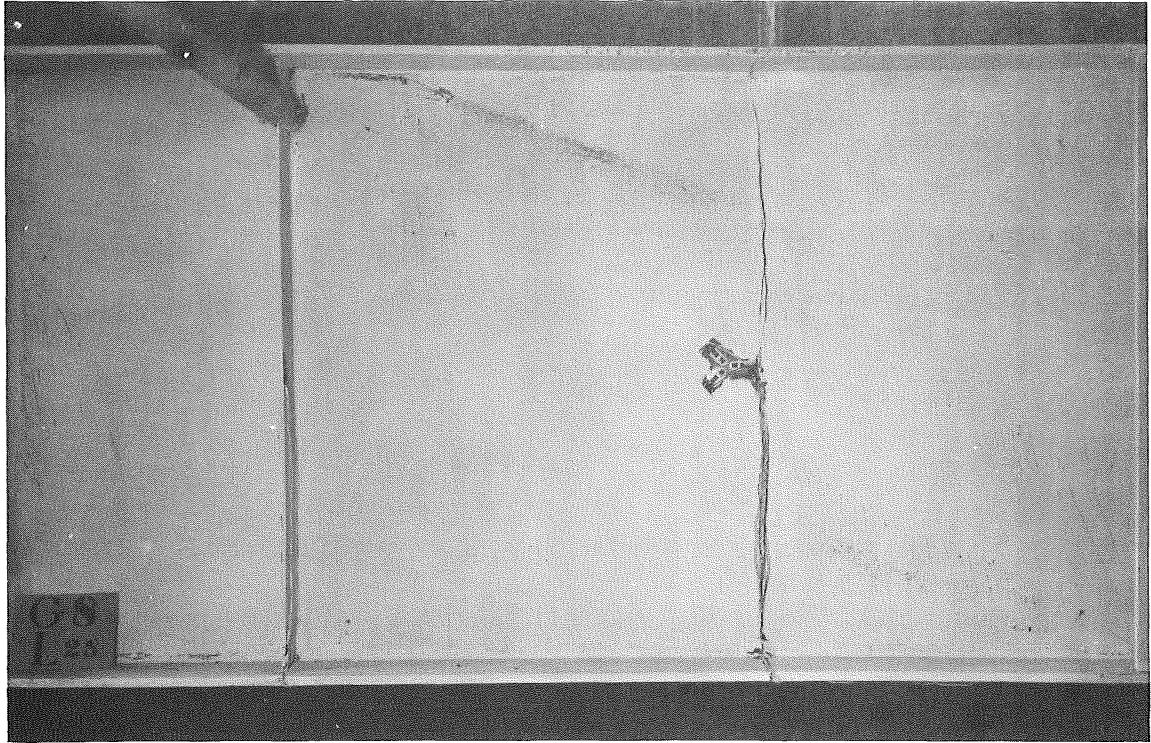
Failure of Girder G8 in Test T3
